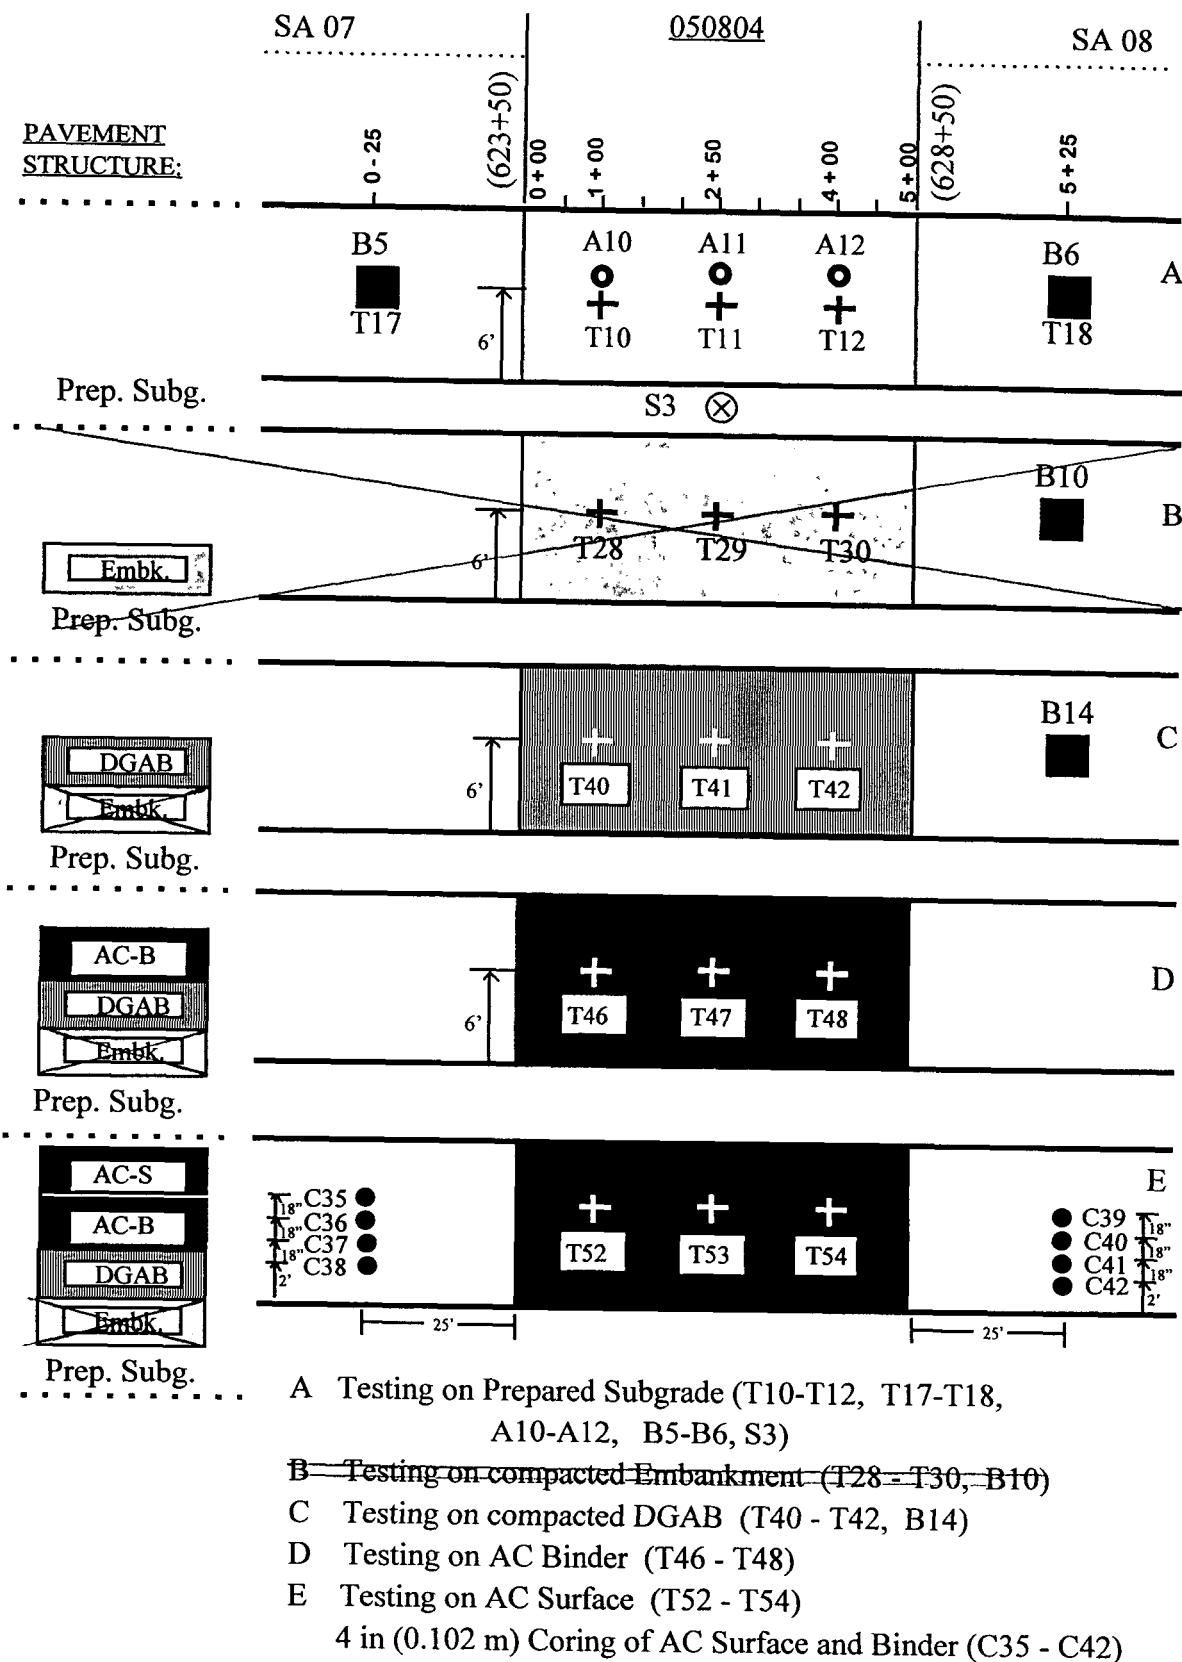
SAMPLING AND TESTING PLAN FOR TEST SECTION 050804
